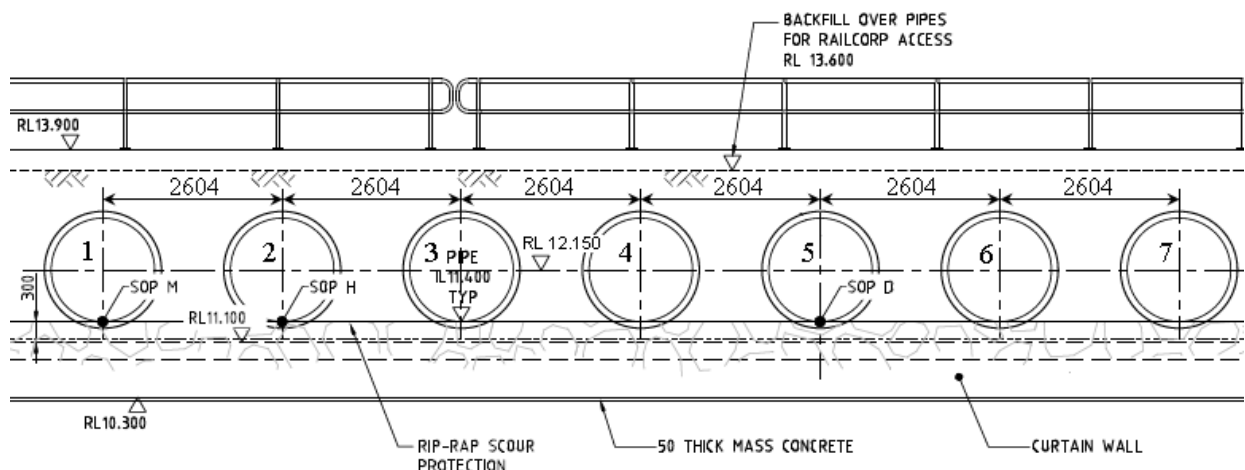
Gerringong Bypass Belinda Street Culvert C4480 finished cross section at embankment toe.
